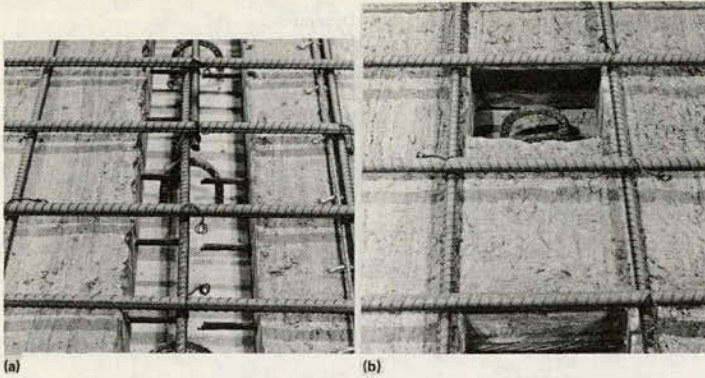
Details of (a) interior panels and (b) exterior panels of full-scale bridge.
